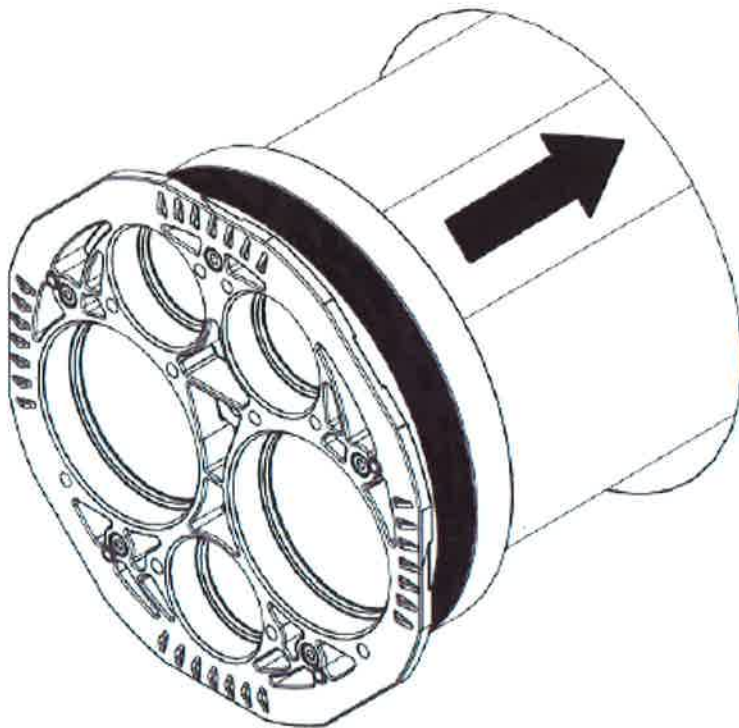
Installation of the MSH-FW building entry system in the wall sleeve through the side of the concrete test block which is not charged with water pressure (picture of the manufacturer).
